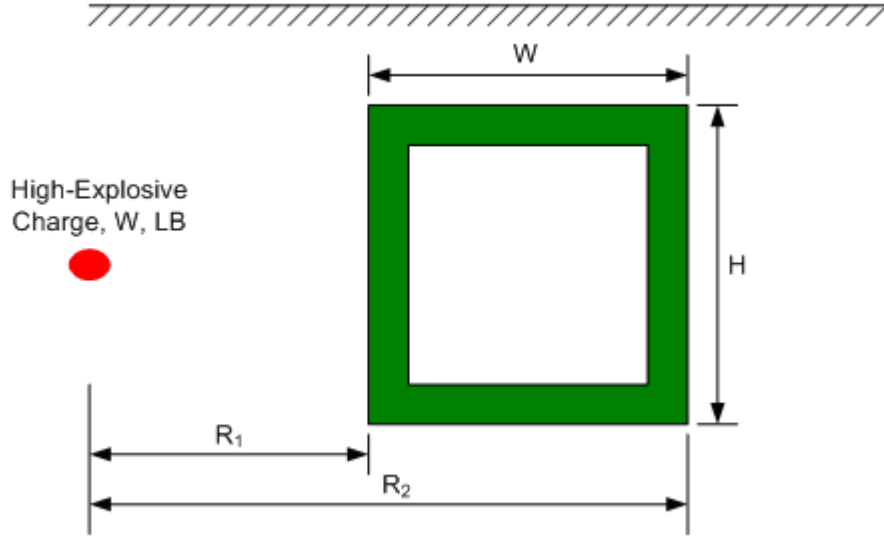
A rectangular underground structure subjected to a subsurface detonation
